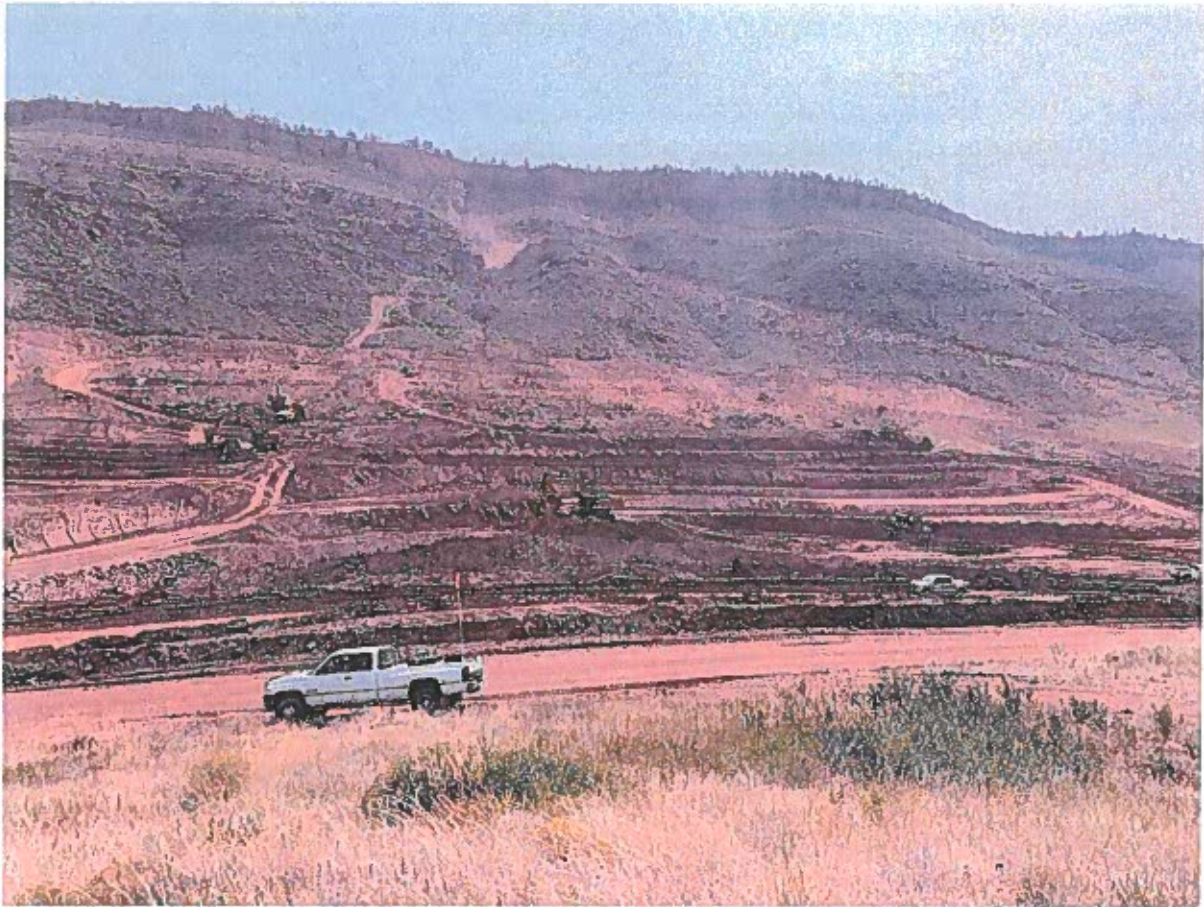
Main Dam Common Excavation at the Upstream Right Abutment
